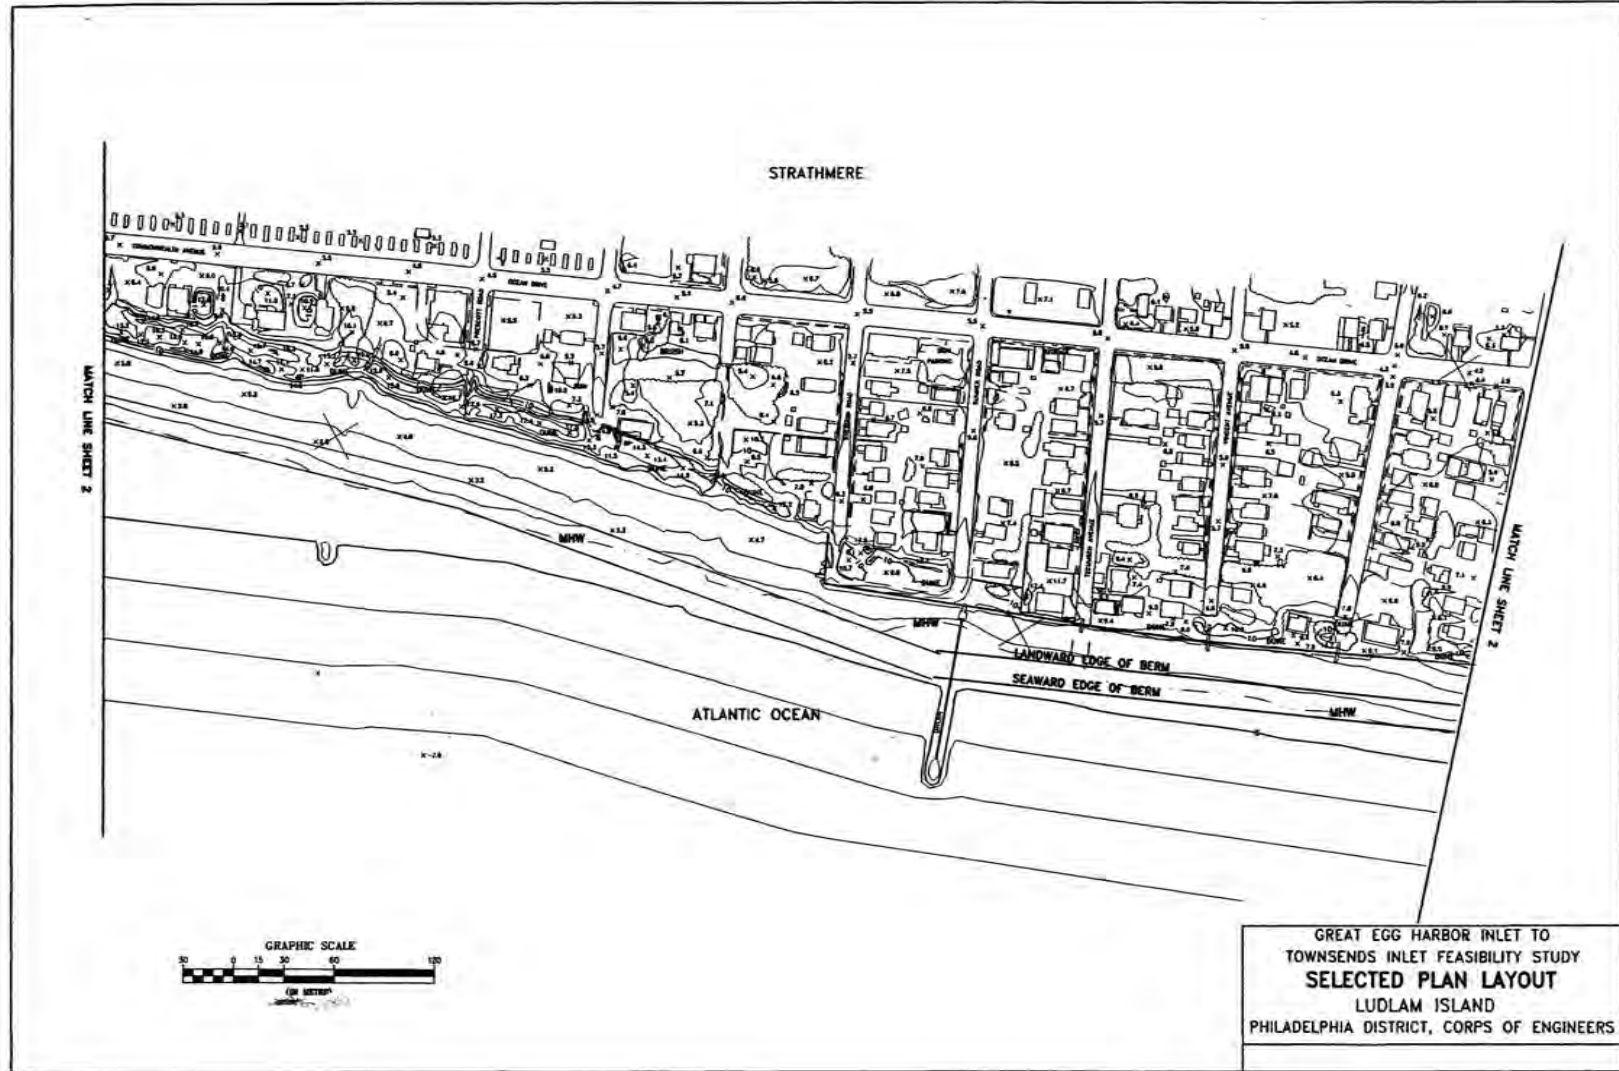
Selected Plan Layout for Ludlam Island, NJ – Whittier Ave to south of Prescott Ave, Strathmere
